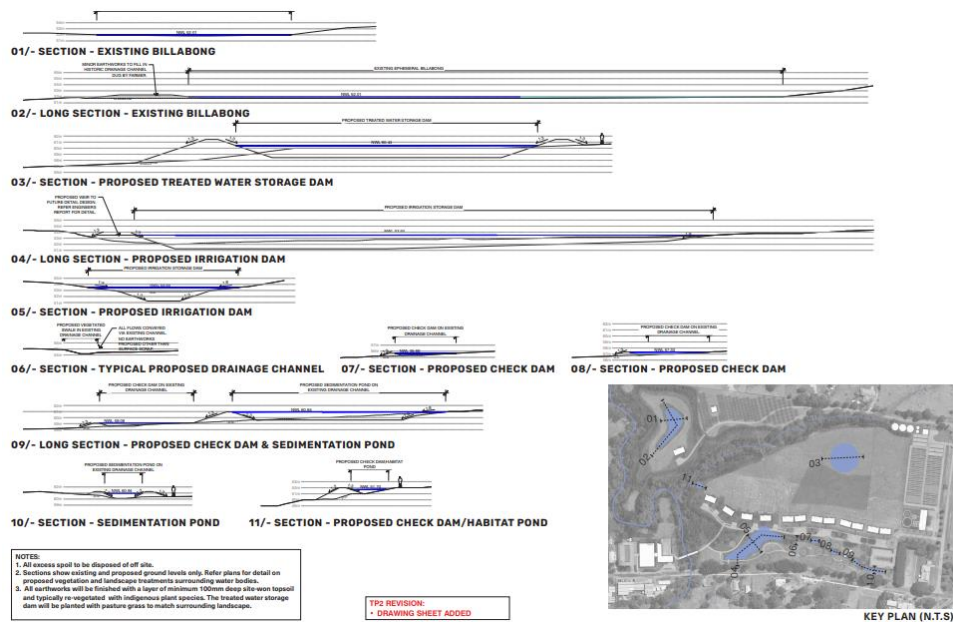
Cross sections of the proposed water bodies (Source: PWLA)
